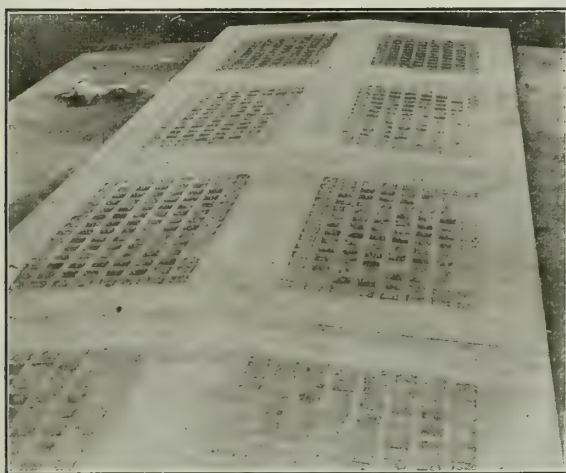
"BRUNER" SKYLIGHT CONSTRUCTION
